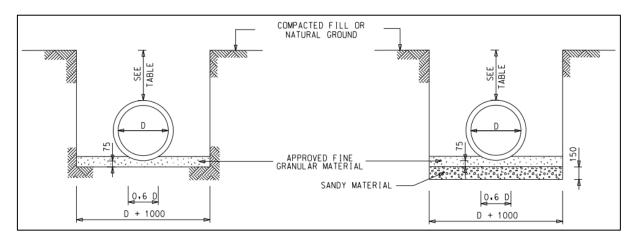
Proposed typical pipe culvert designs in hard material (left) and soft material (right). Source: AURECON (2020).
